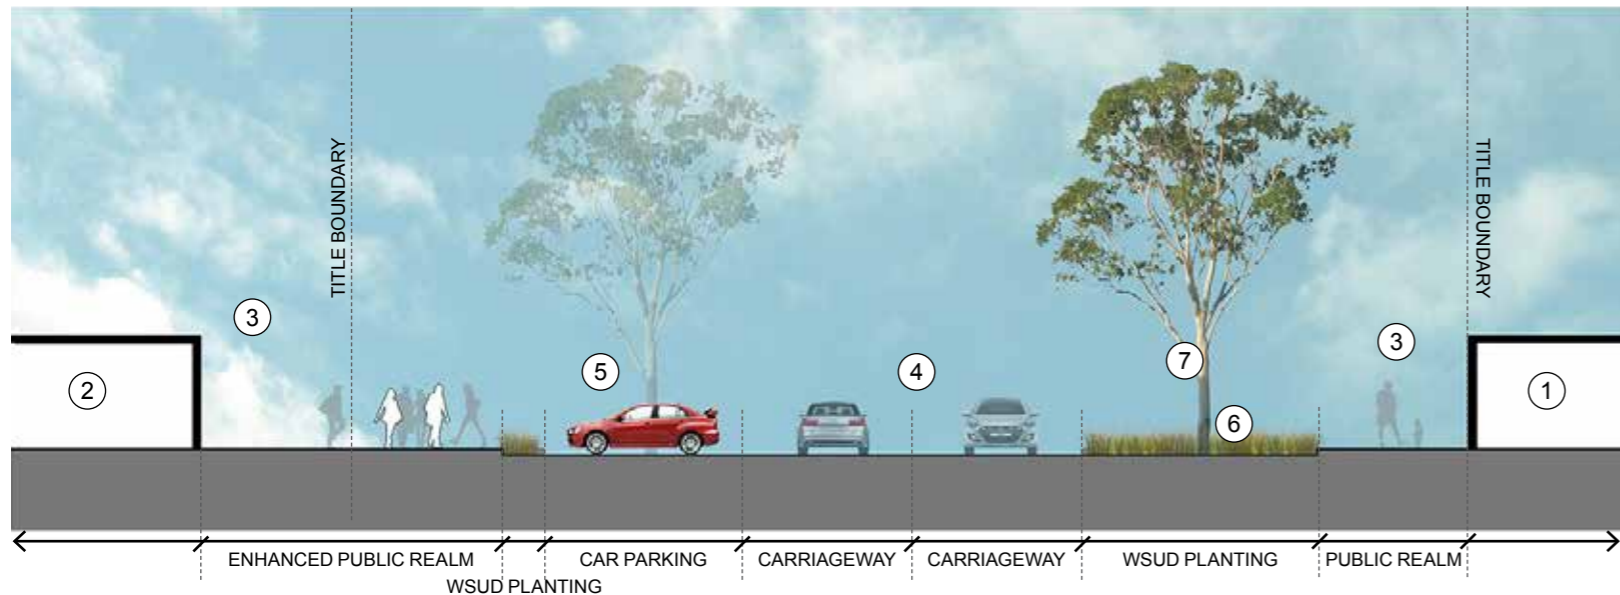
Kinglake proposed streetscape section (DD)
